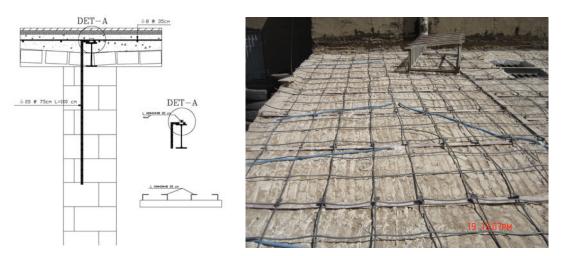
Connection details of added roof slab to the walls (left), and the slab construction (right)
